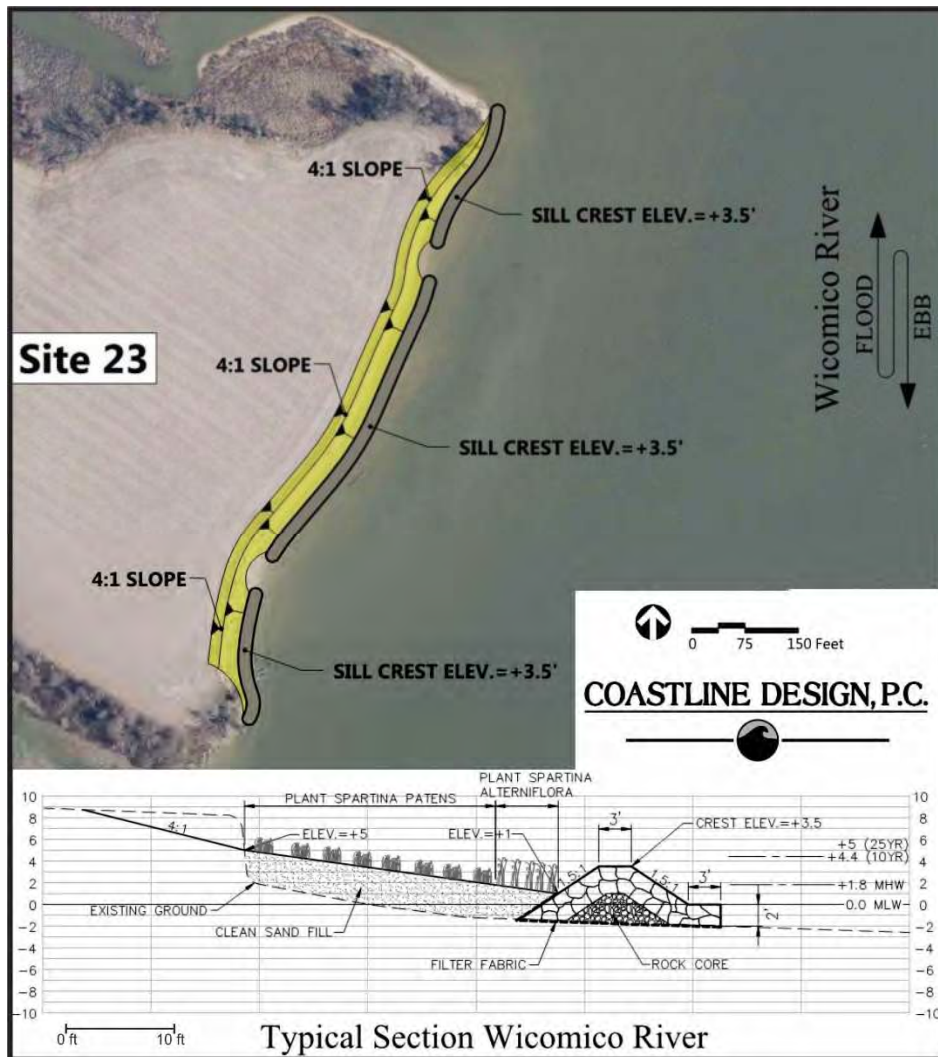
Site 23 conceptual plan and typical cross-section.
